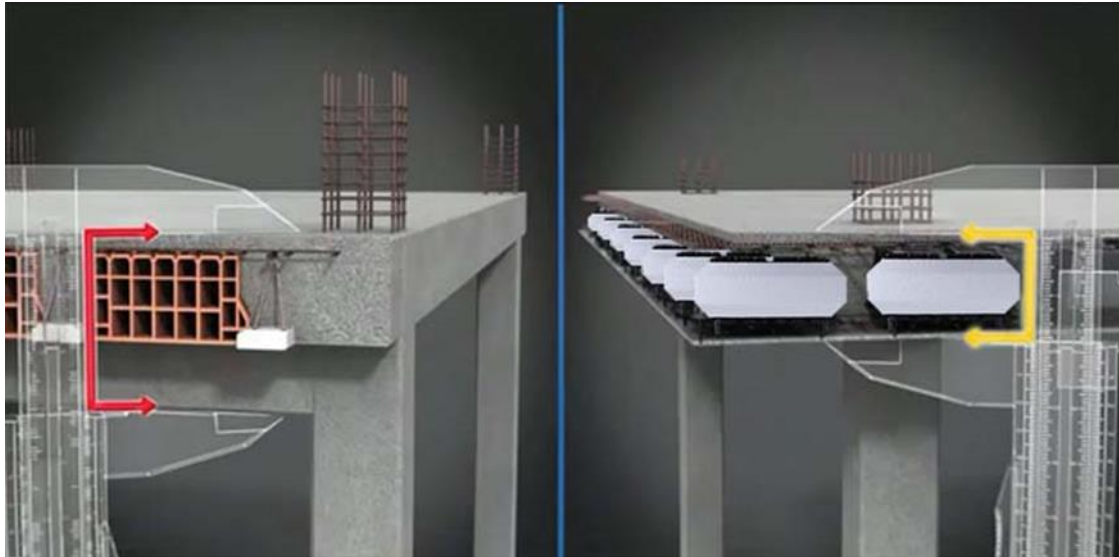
Contruss floor thickness compared to that of rib and block floor
